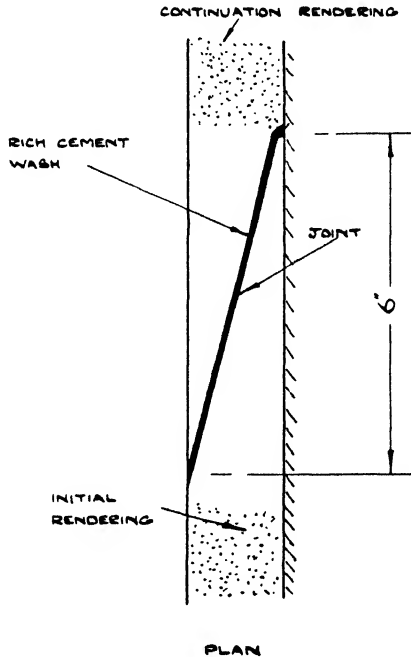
TYPICAL DAYWORK JOINT IN WALL RENDERING
